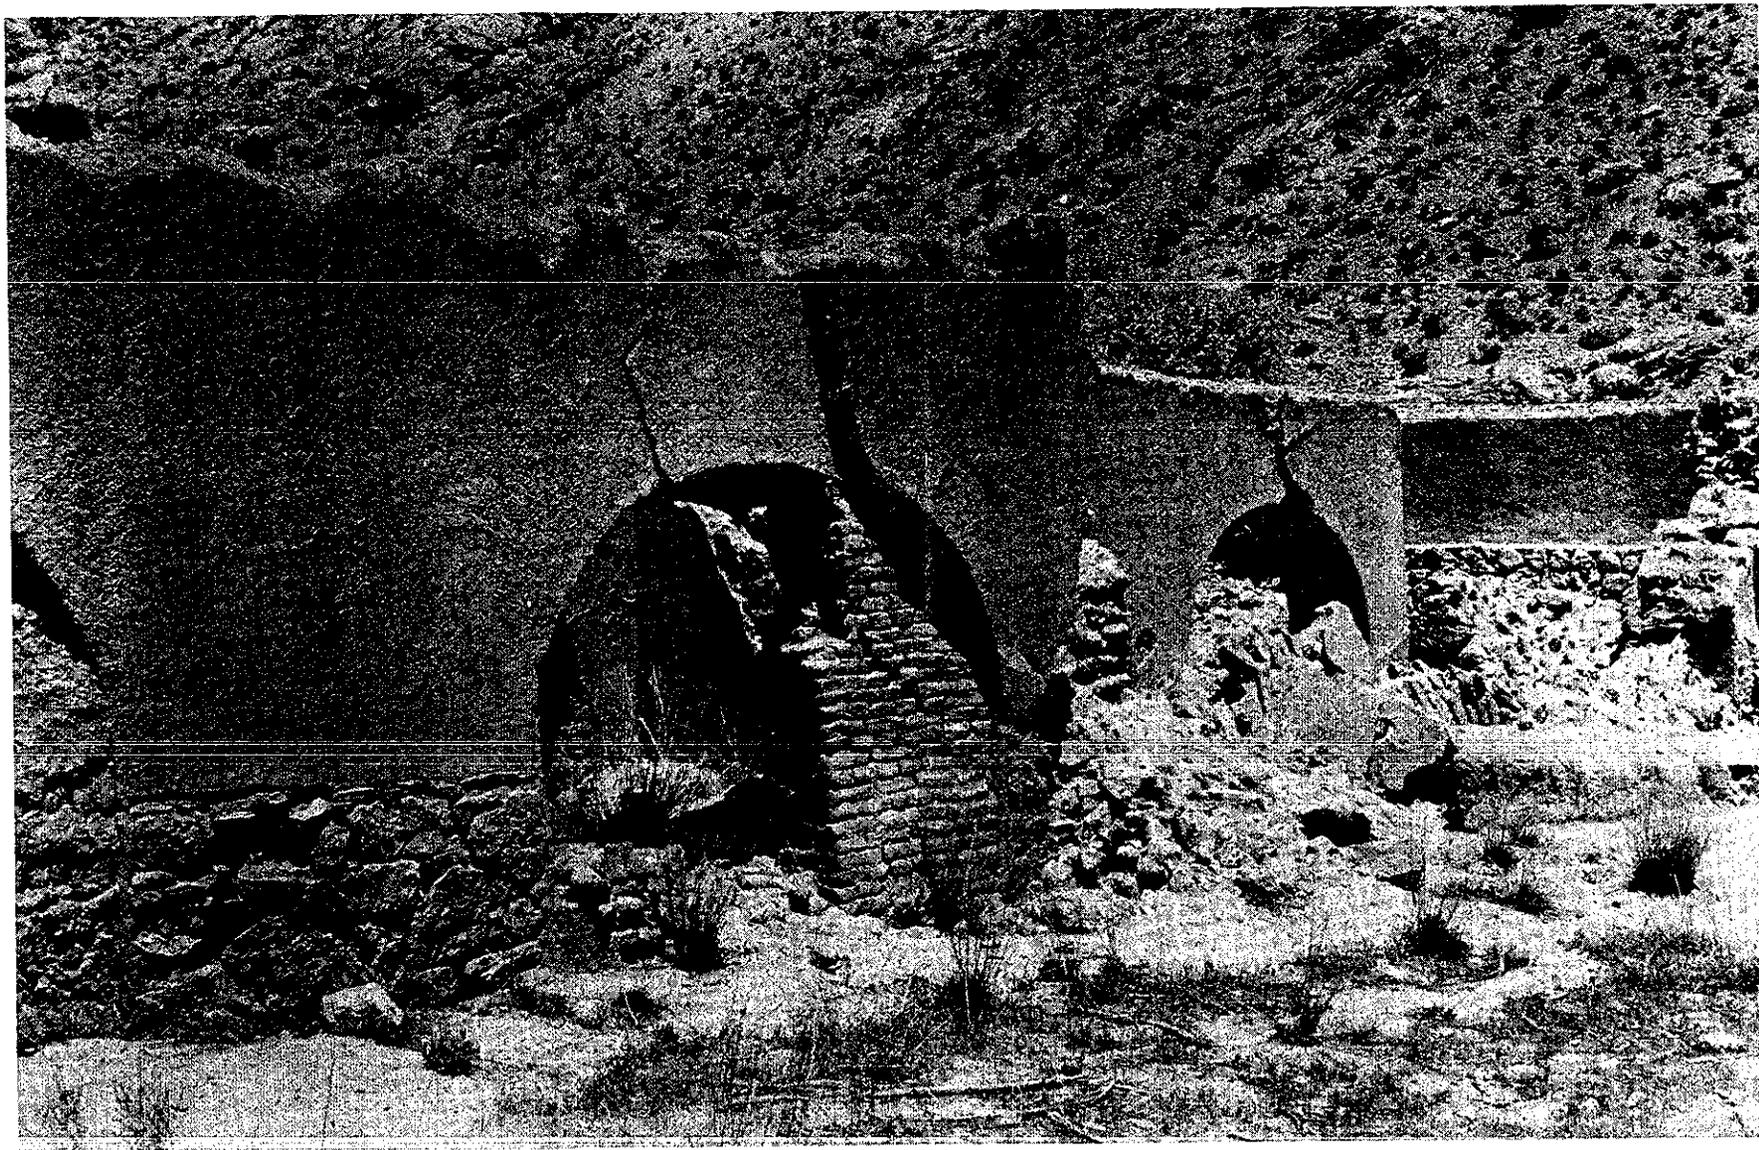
VIEW OF AN EW INTERNAL WALL OF BUILDING AT DARRI AJAR
